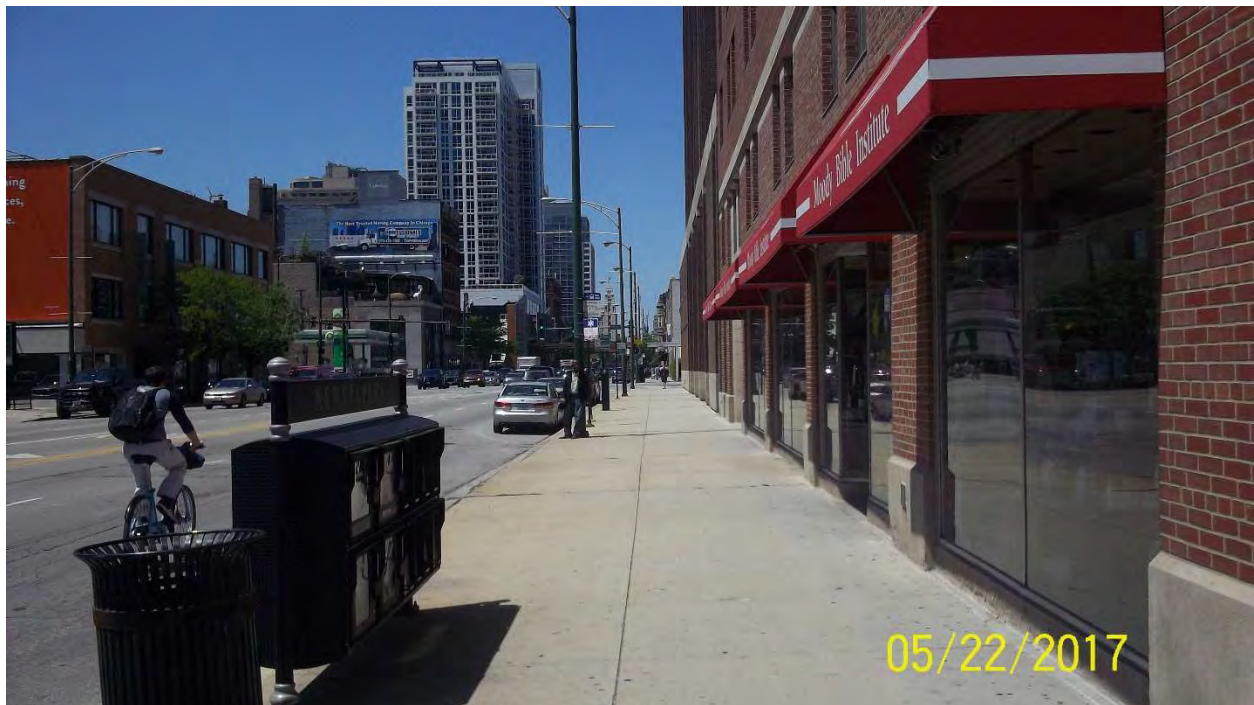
Northwest corner of Chicago Ave. / LaSalle St. – Looking West
